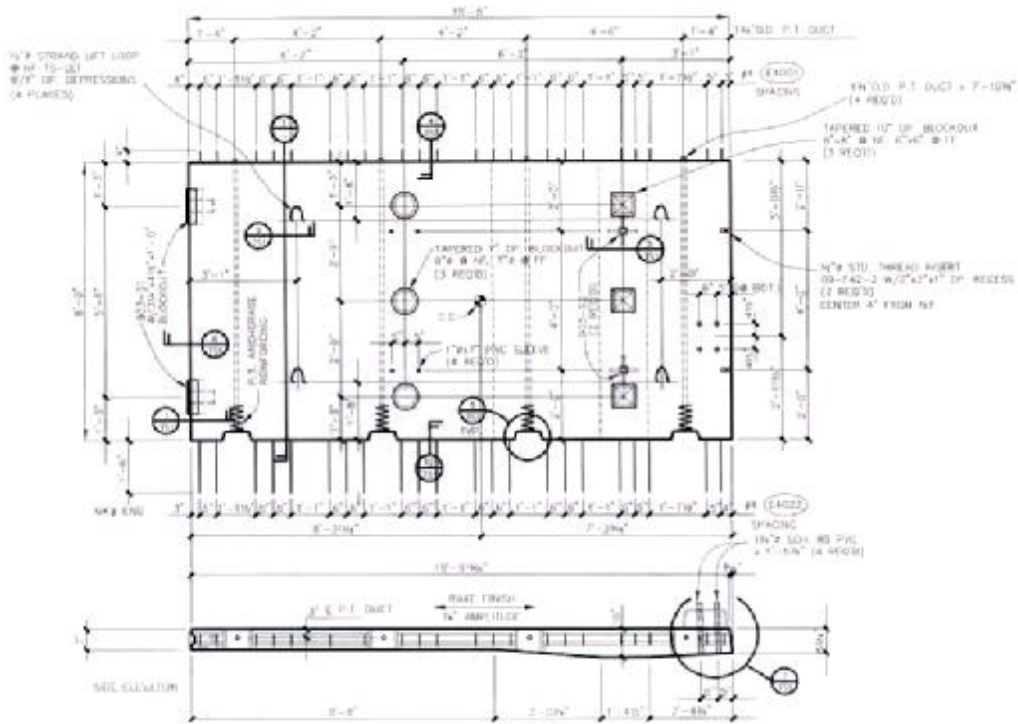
Details of edge panels of a typical 50-ft bay
